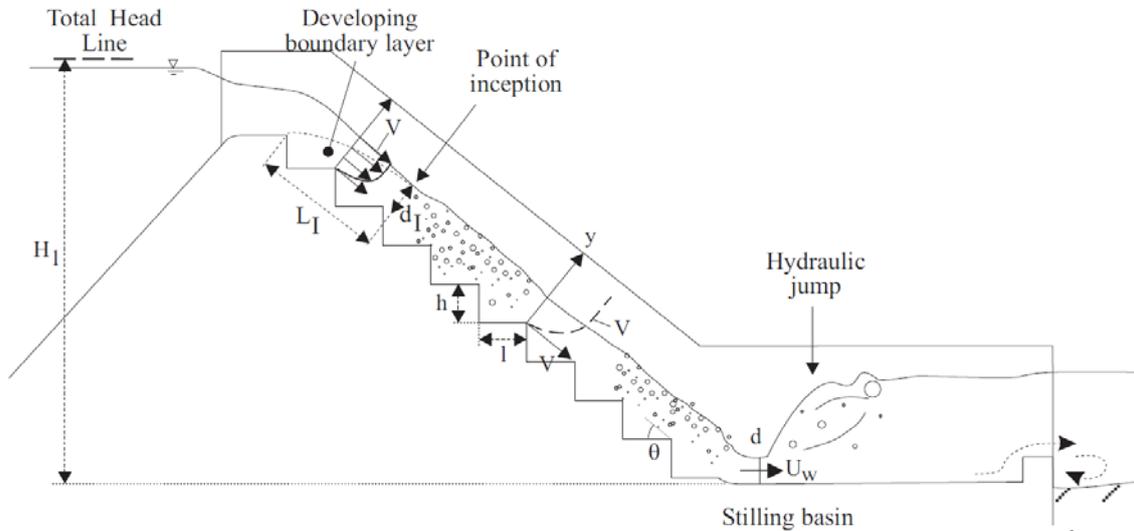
Definition of sketch of an embankment stepped spillway operation with downstream hydraulic jump stilling basin
